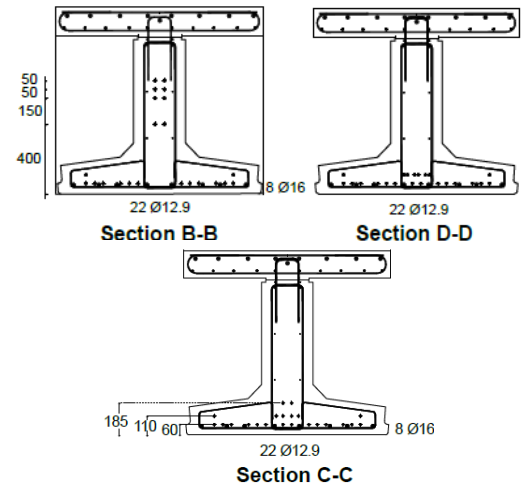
Cross-section and reinforcement arrangement for the beam S10H2D.
